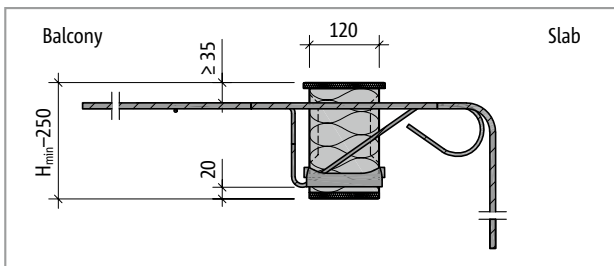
Schöck Isokorb® XT type K-WU: Product section
